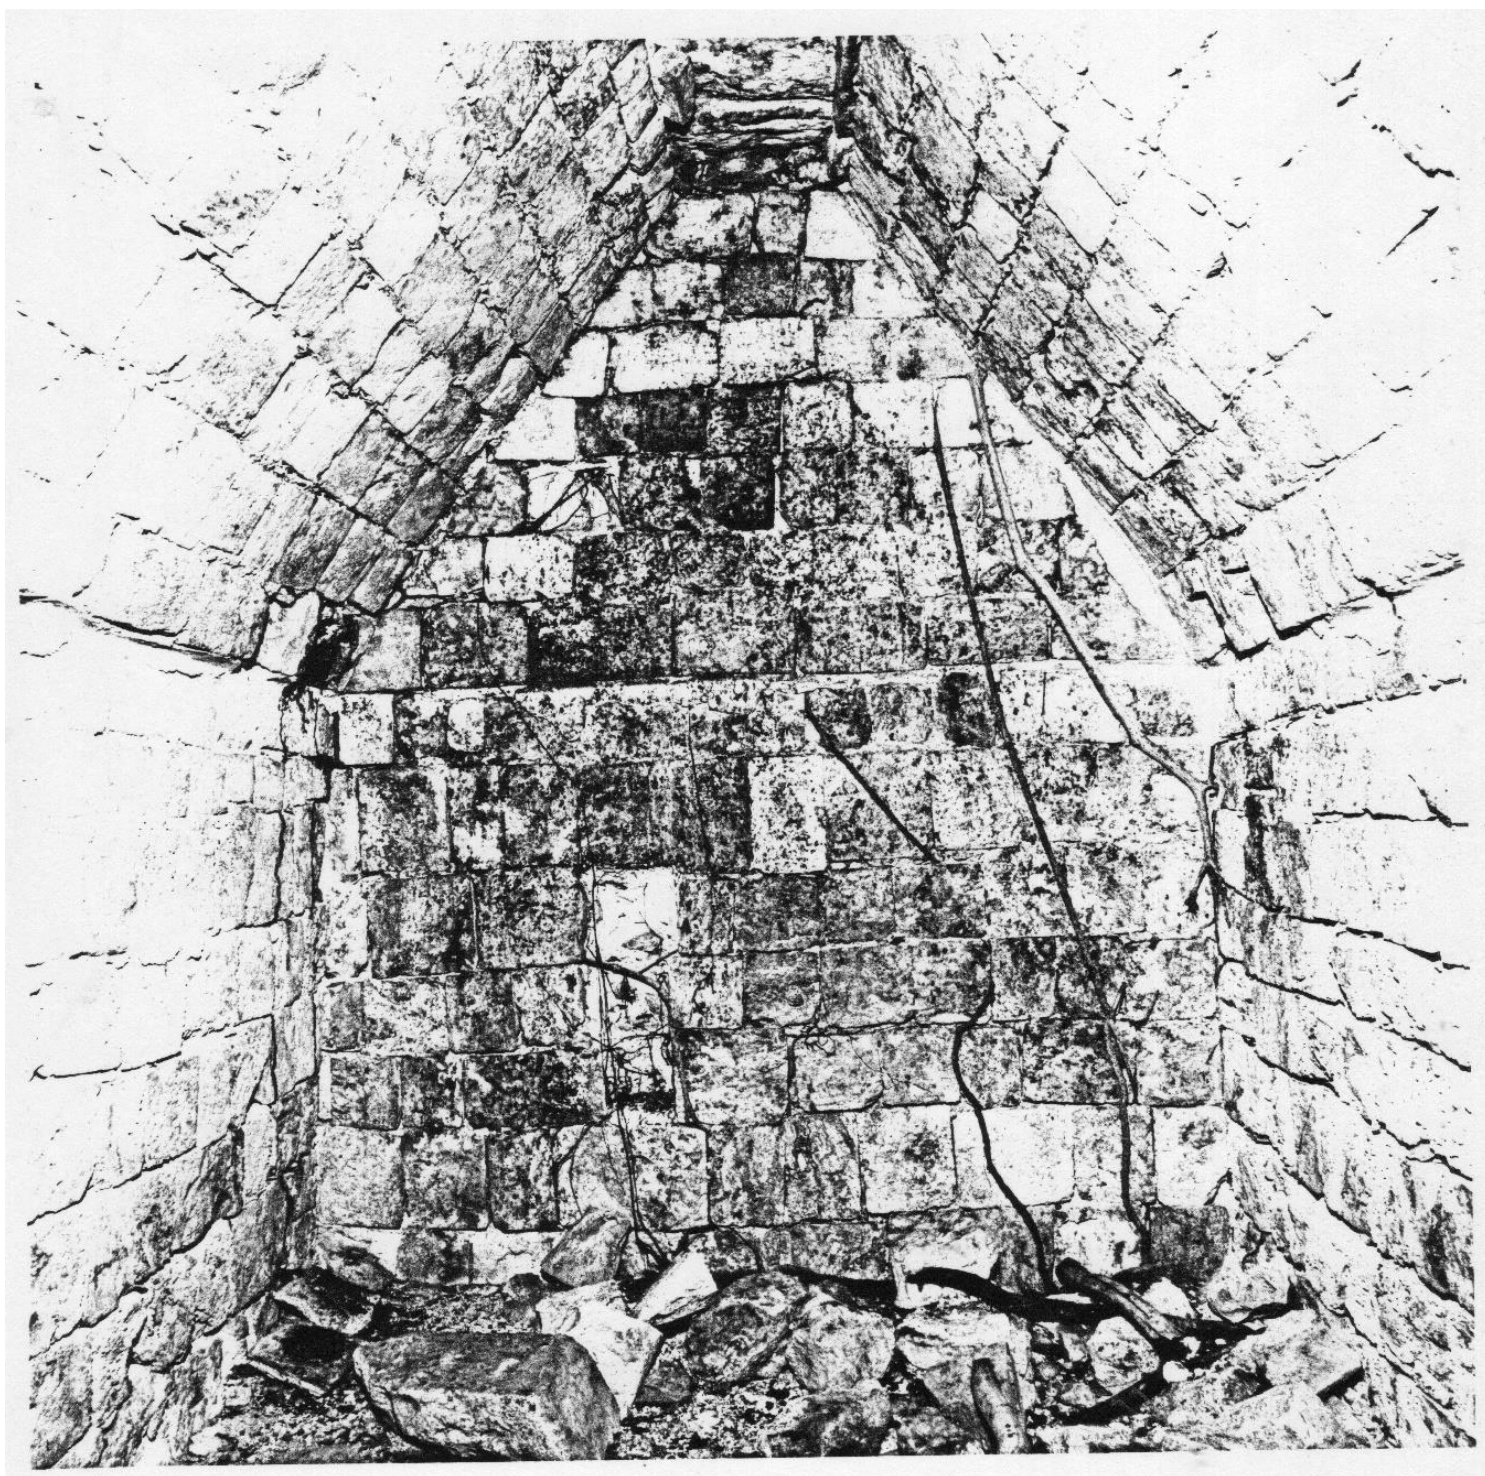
Here the room has a Puuc spring on the end wall, the room is wide, and the wall and soffit stones have more even edges and corners than in most Chenes rooms--yet the masonry here is not "as Puuc" as that of the Southwest Building. Southeast Quadrangle, East Range, Room 2, looking north.
